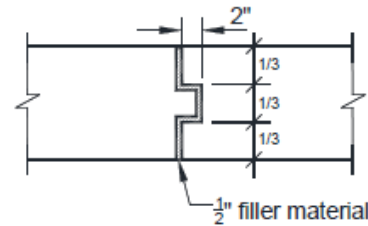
MASONRY CONTROL JOINT DETAIL
